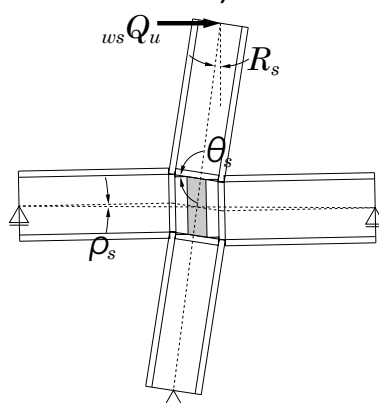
Fracture Mechanism 2 Set Based on 4-point Bending Test Results (damage to front fillet weld)
